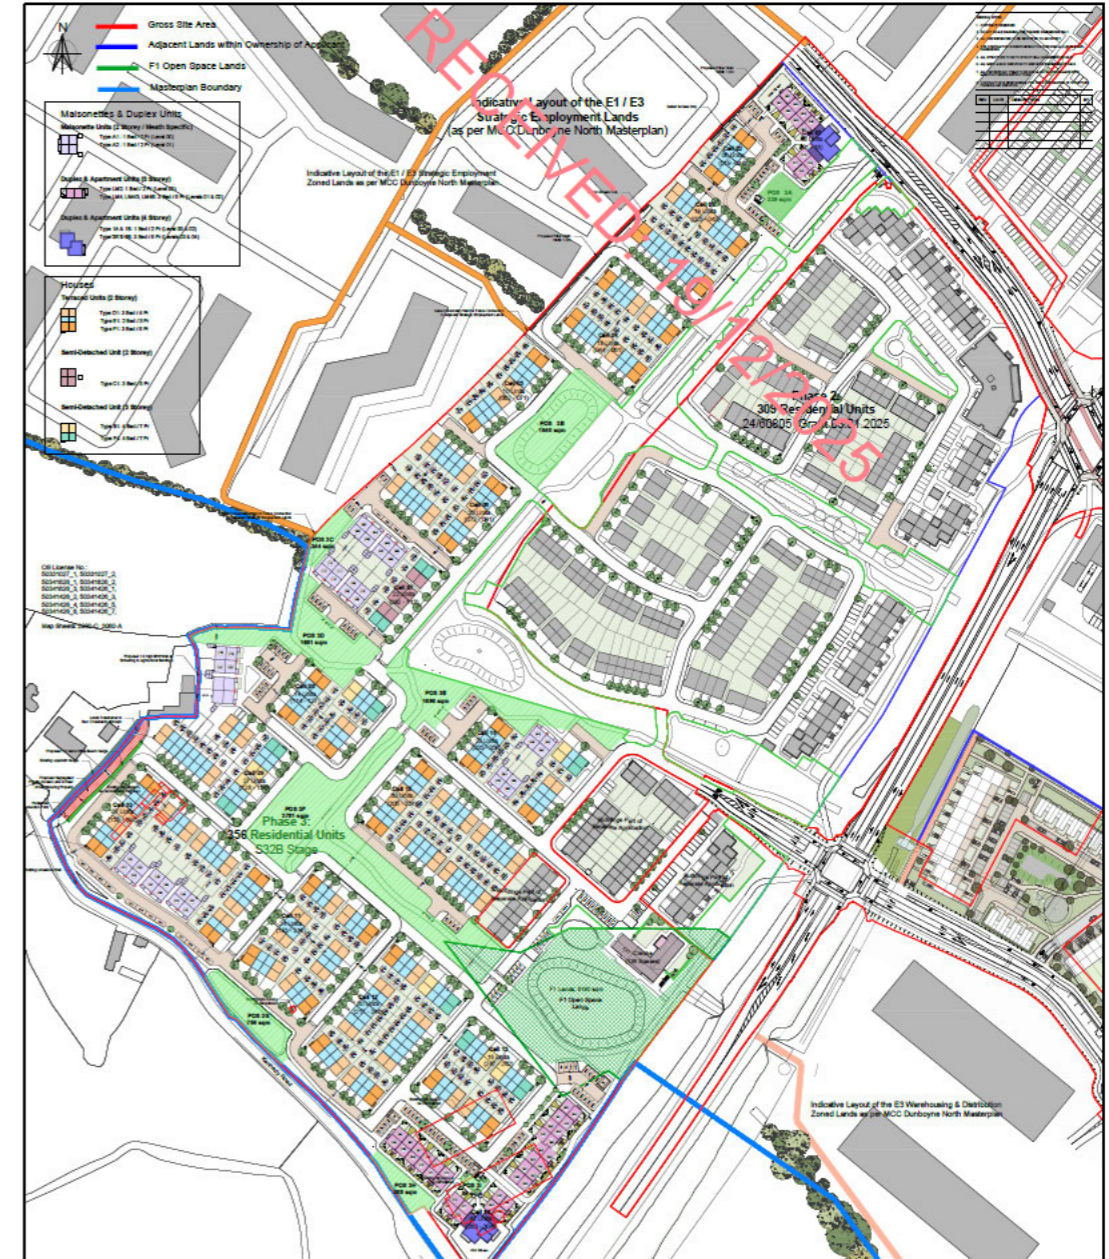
Proposed Site Layout Plan (Source: John Fleming Architects)
